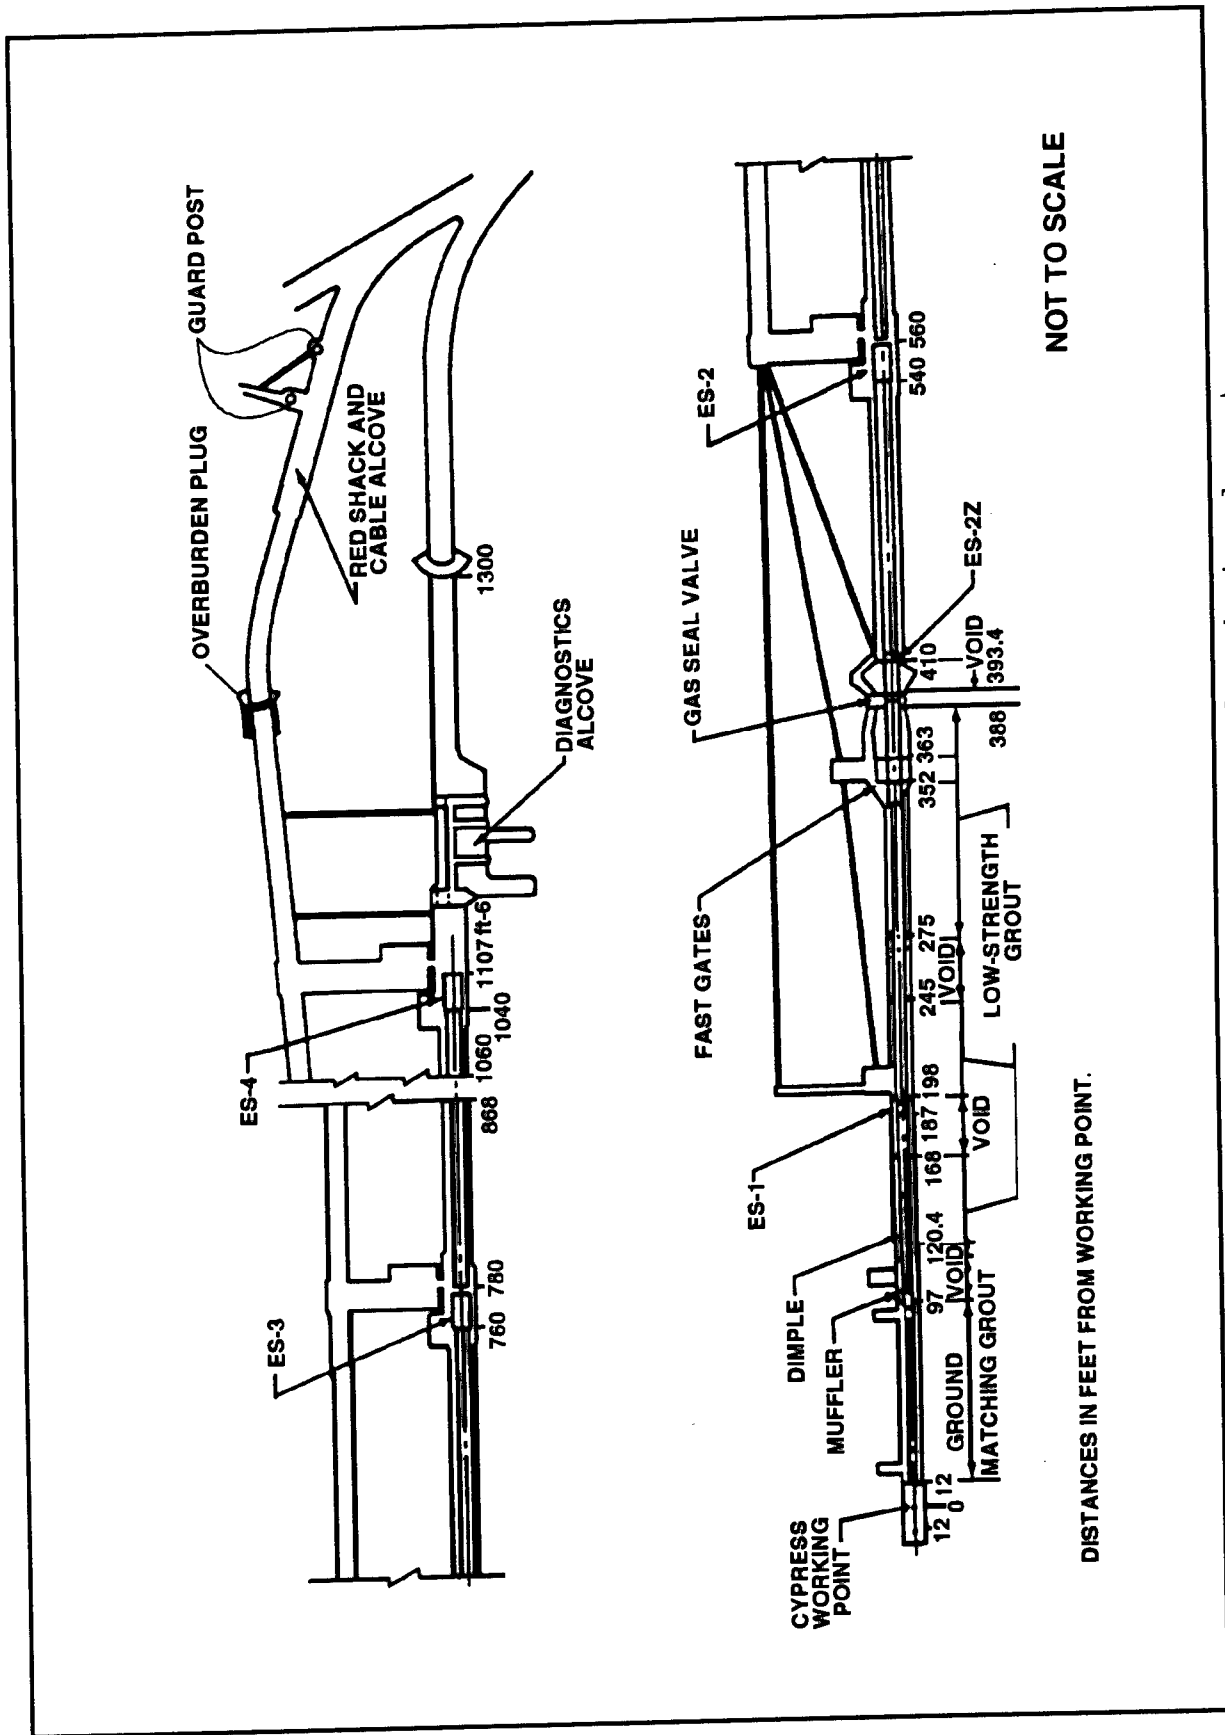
CYPRESS event - tunnel and pipe layout.
